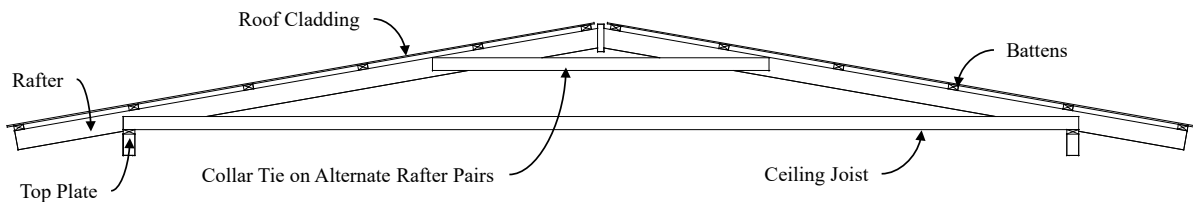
ROOF STRUCTURE OF HOUSE TYPE 1
